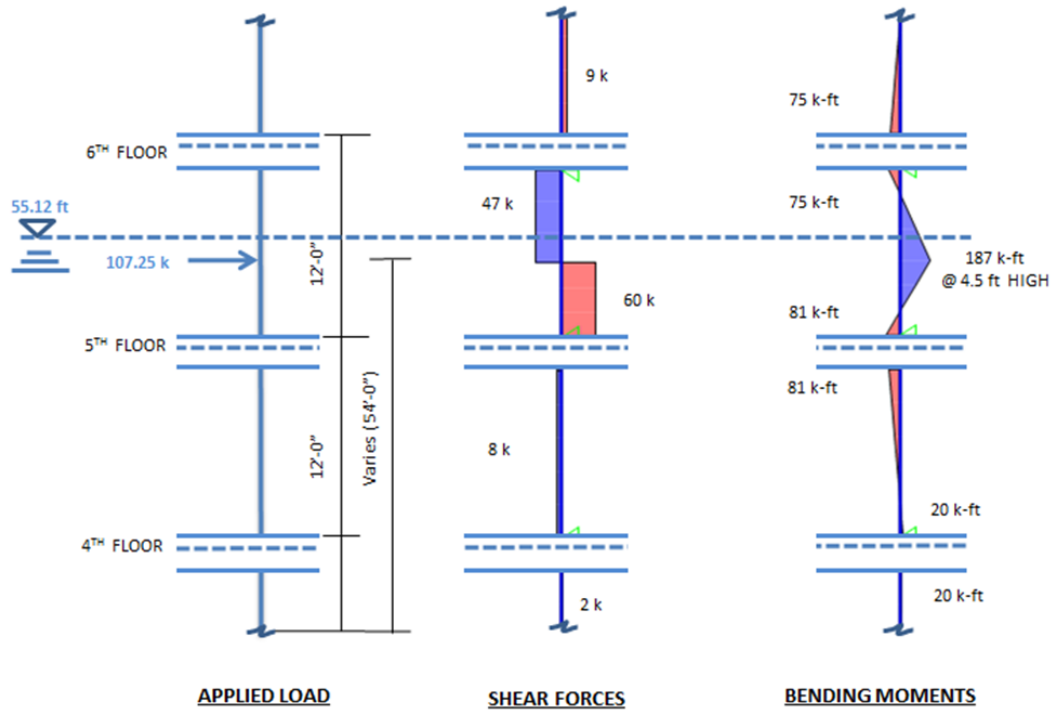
Impact load applied at " $d + h_c$ " away from the end of column on the 5th floor
